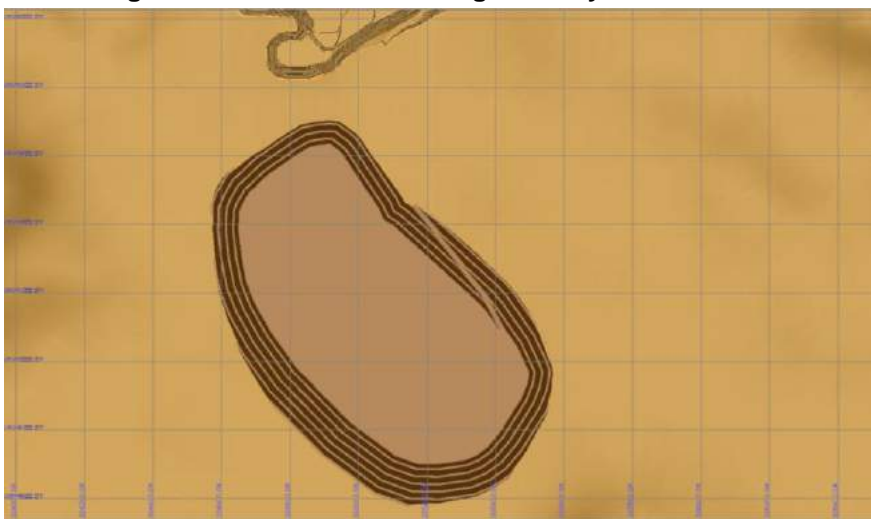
5 – Waste Storage Facility – Cana Brava
